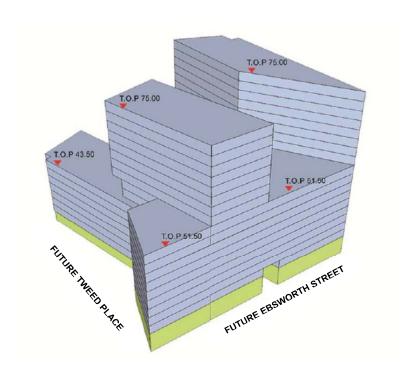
Proposed Building Envelopes – Corner future Ebsworth Street and future Tweed Place
